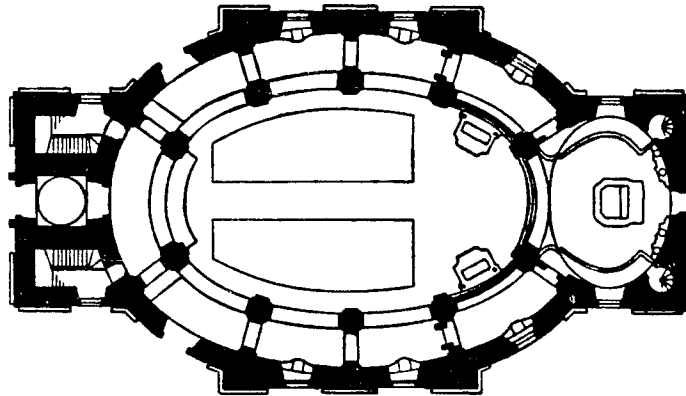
Floorplan of the Wallfahrtskirche Steinhausen
